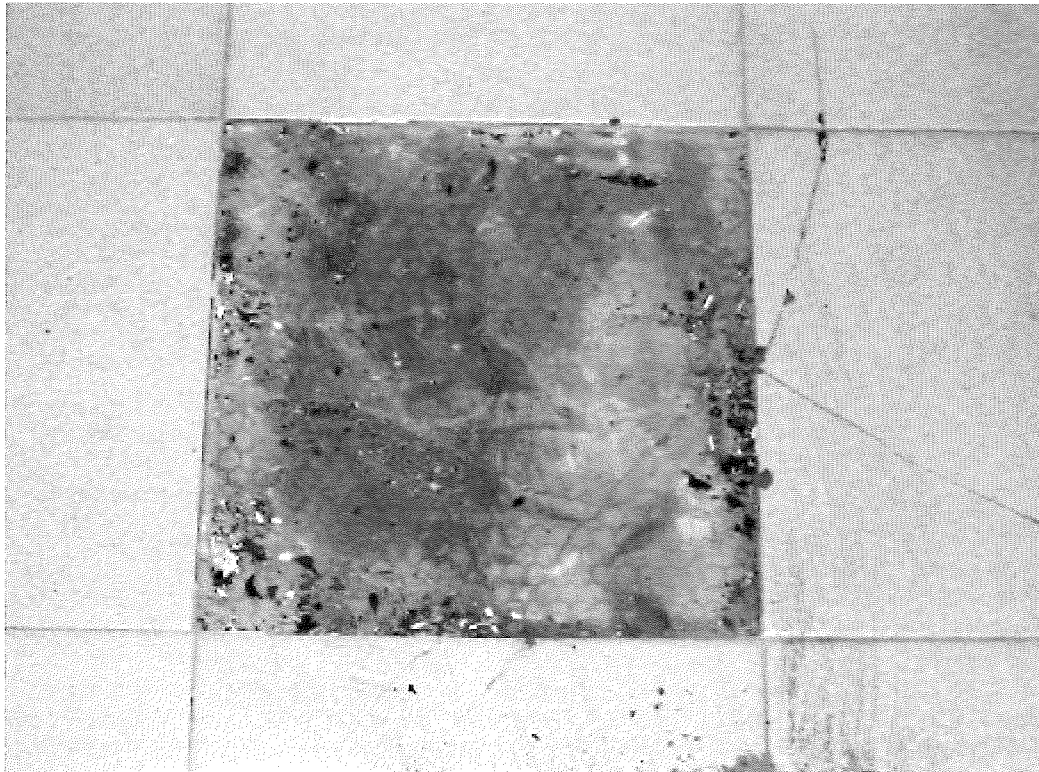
Flooring laid on adhesive that cracked due to shrinkage of the underlying mortar (note that the mortar is also cracked).
